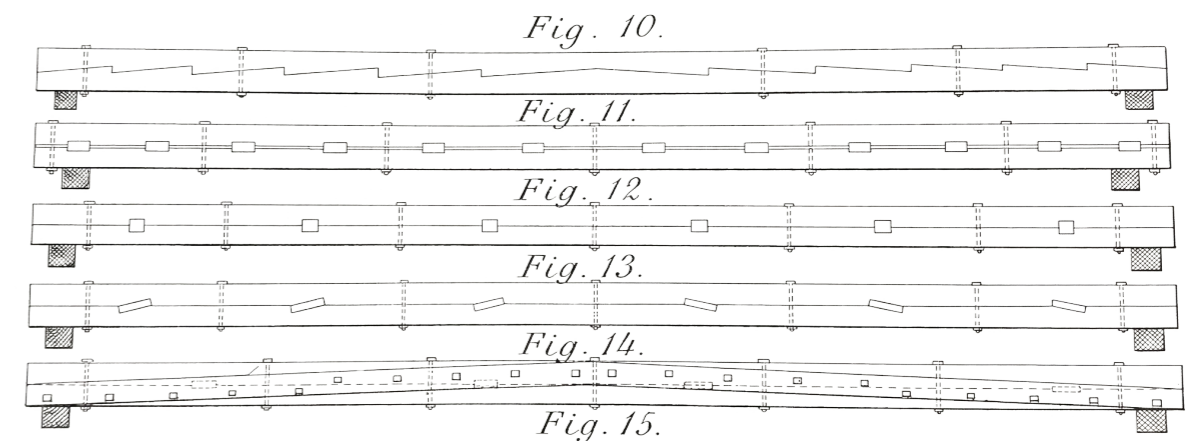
Various reinforcements and offsets of timber beams(Henket et al., 1889)
